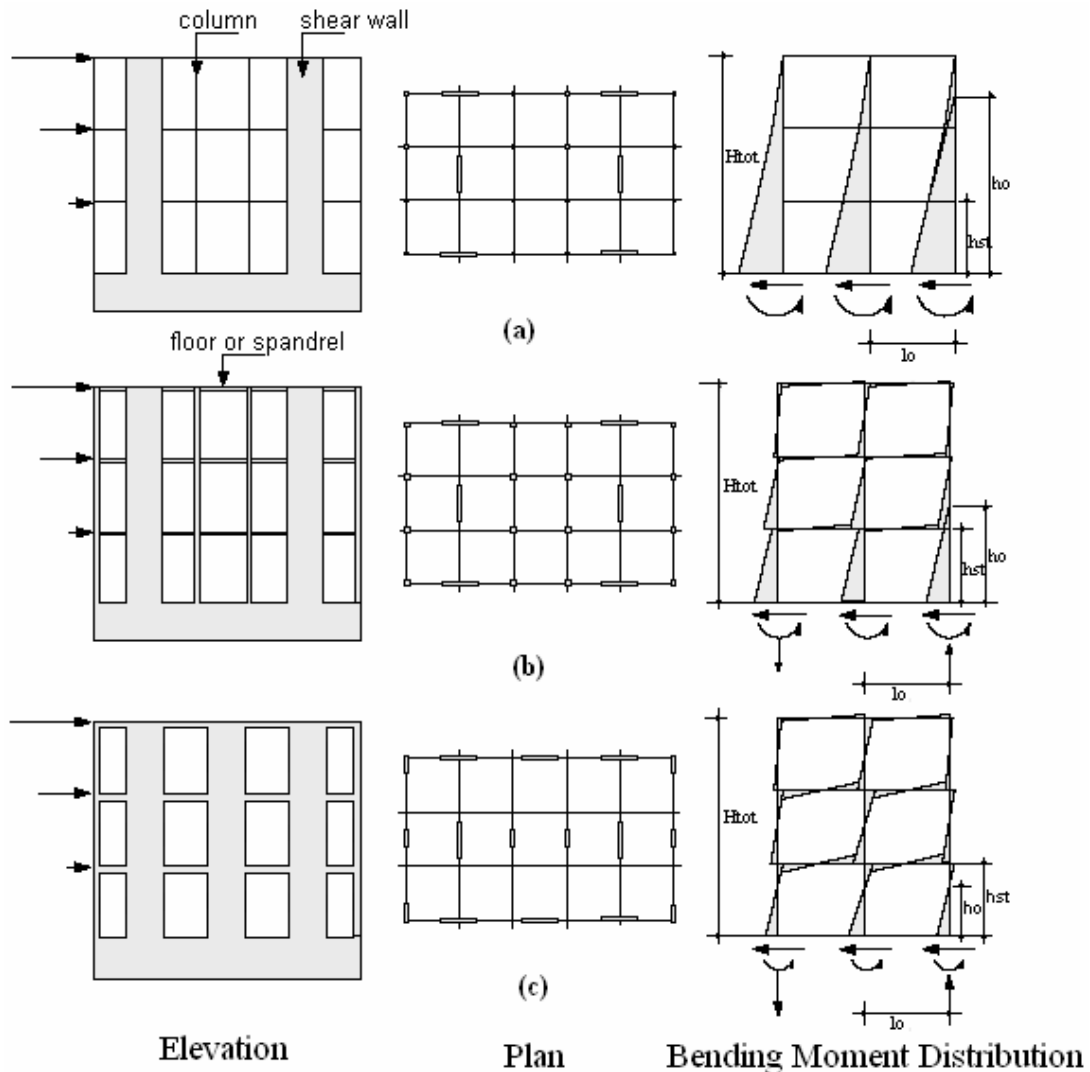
Types of structural wall systems with moment distribution for shear walls
